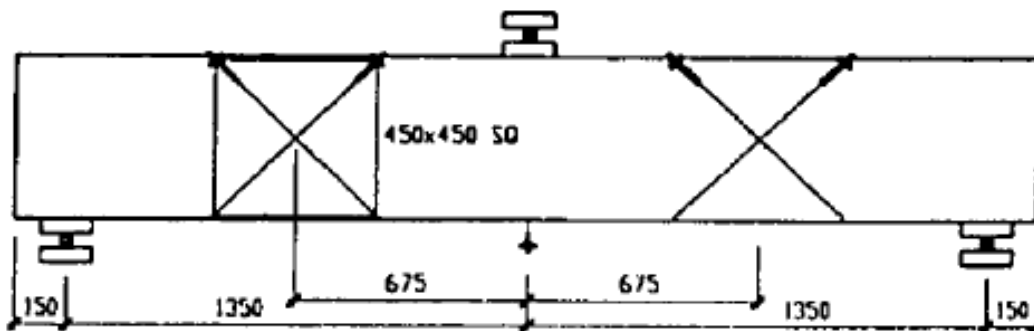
Elevation detailing of bond experiment (Stanik, 1998)
